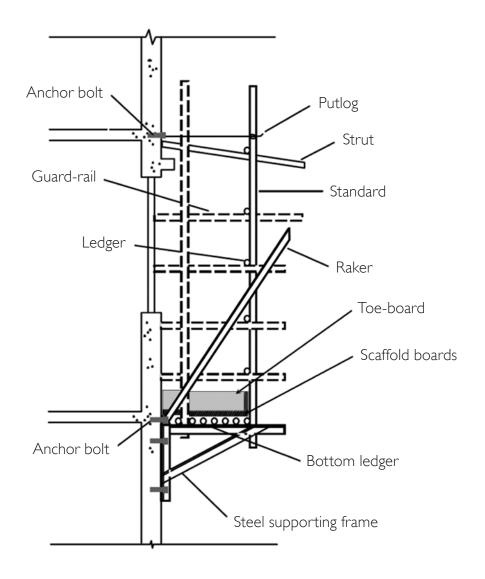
Truss-out bamboo scaffold (side elevation - not to scale)
